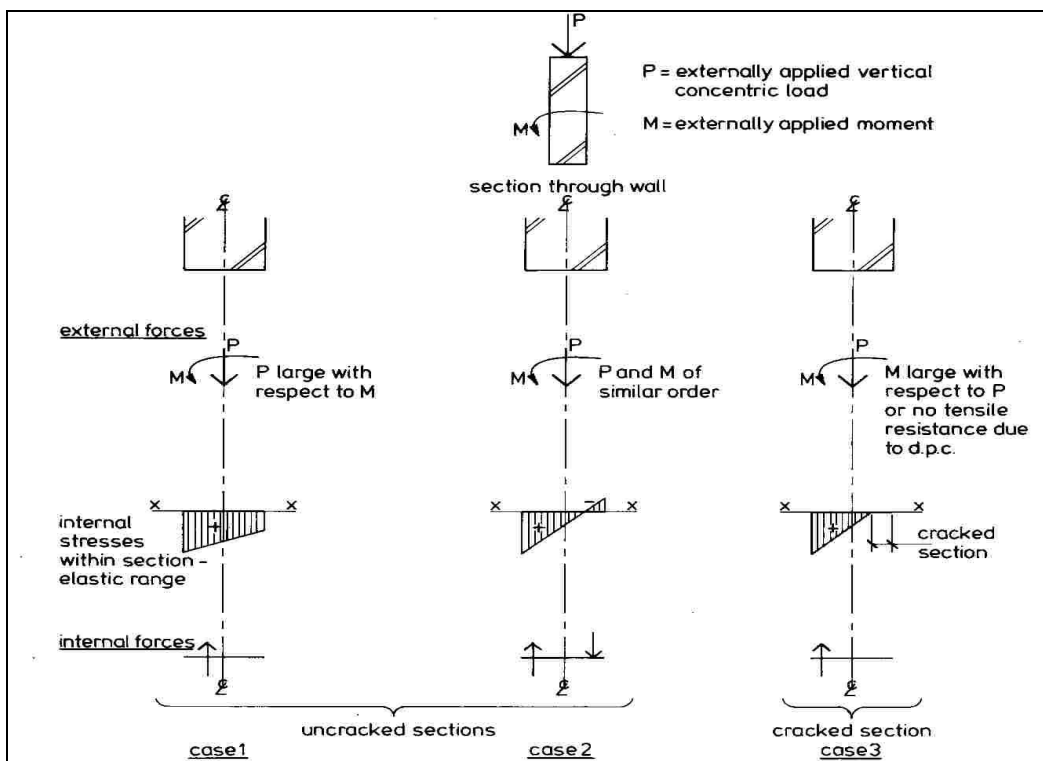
Stresses in a Masonry Wall (Curtin, 1985:60)
